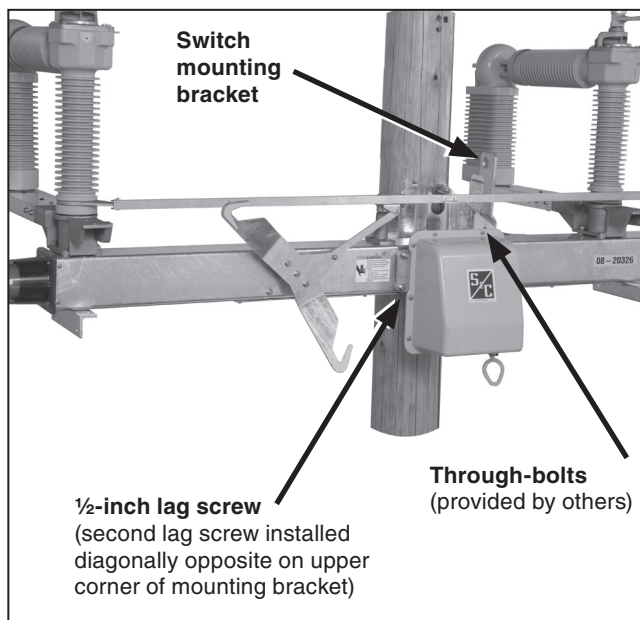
Guiding switch into through-bolts (vertical mounting configuration shown).
